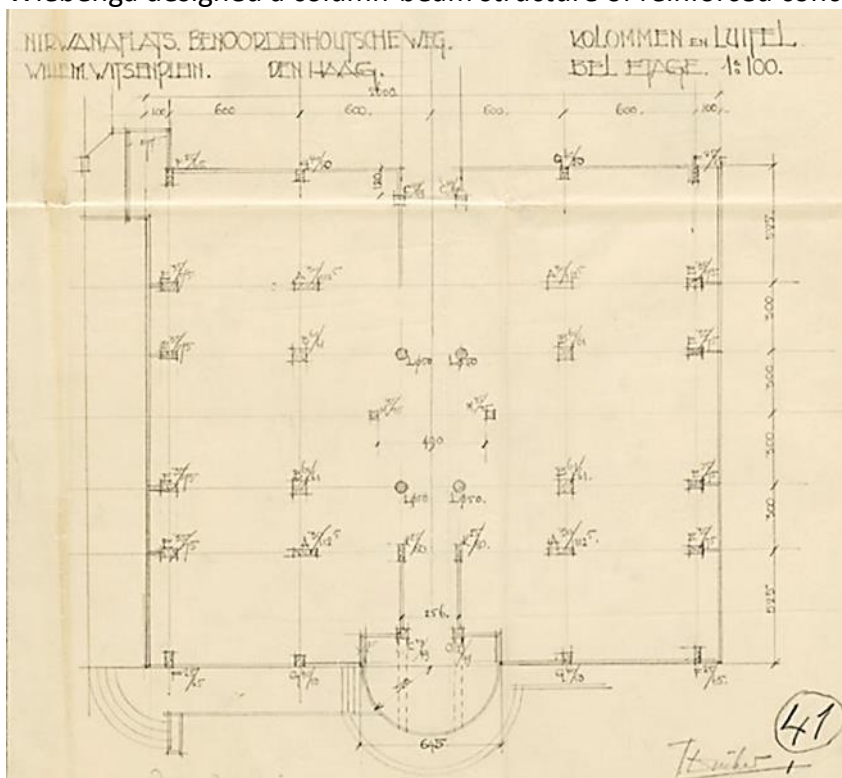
Construction drawing of concrete columns structure, Wiebenga, 1926.
